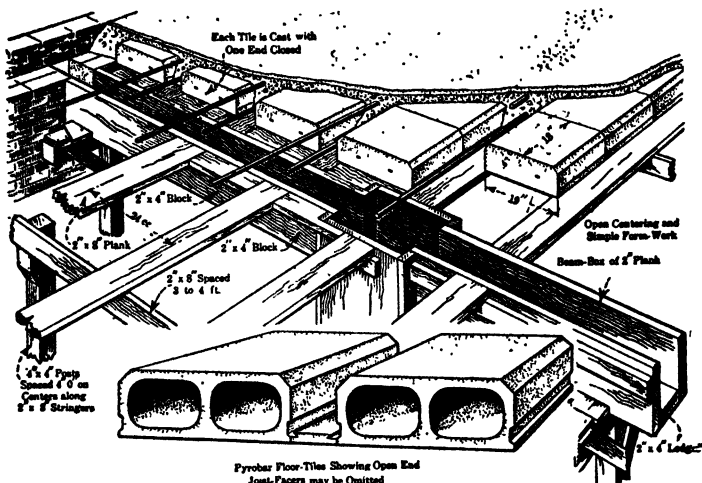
Gypsum Blocks Alternating with Concrete Ribs
